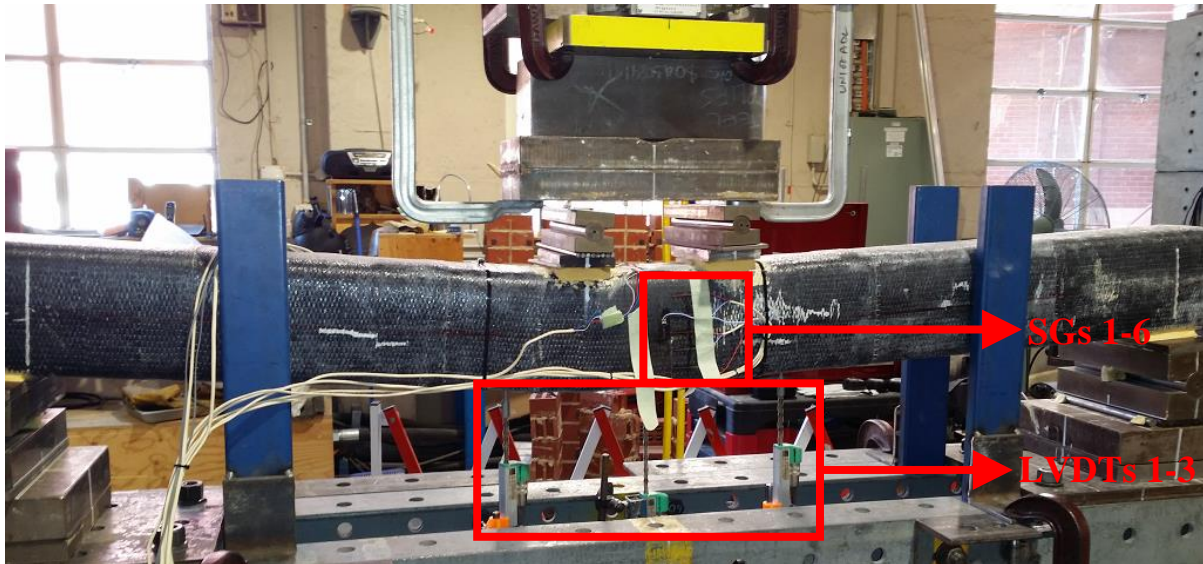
Structural test setup for CFFTs-UHPFRC beam
